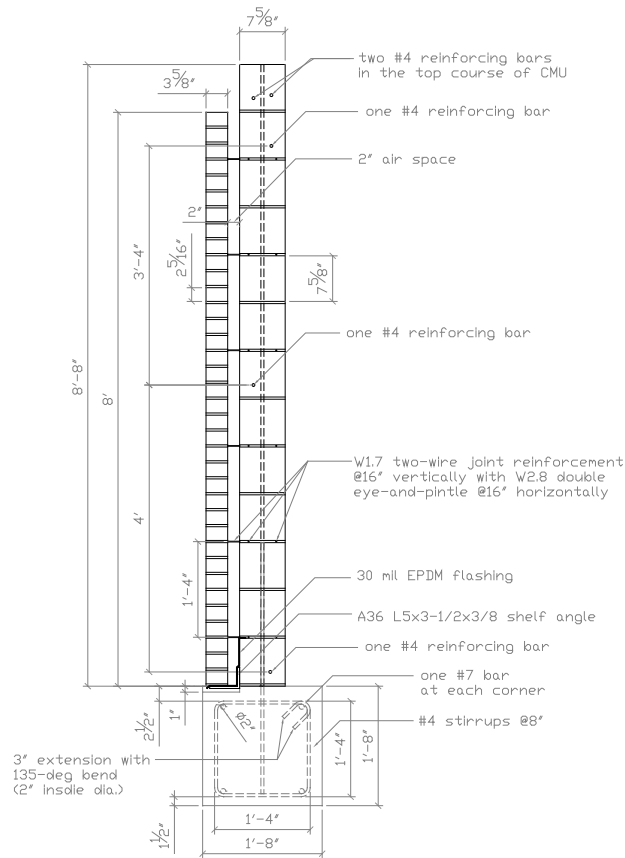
Side view of specimen UT CMU 3 and UCSD CMU 3
